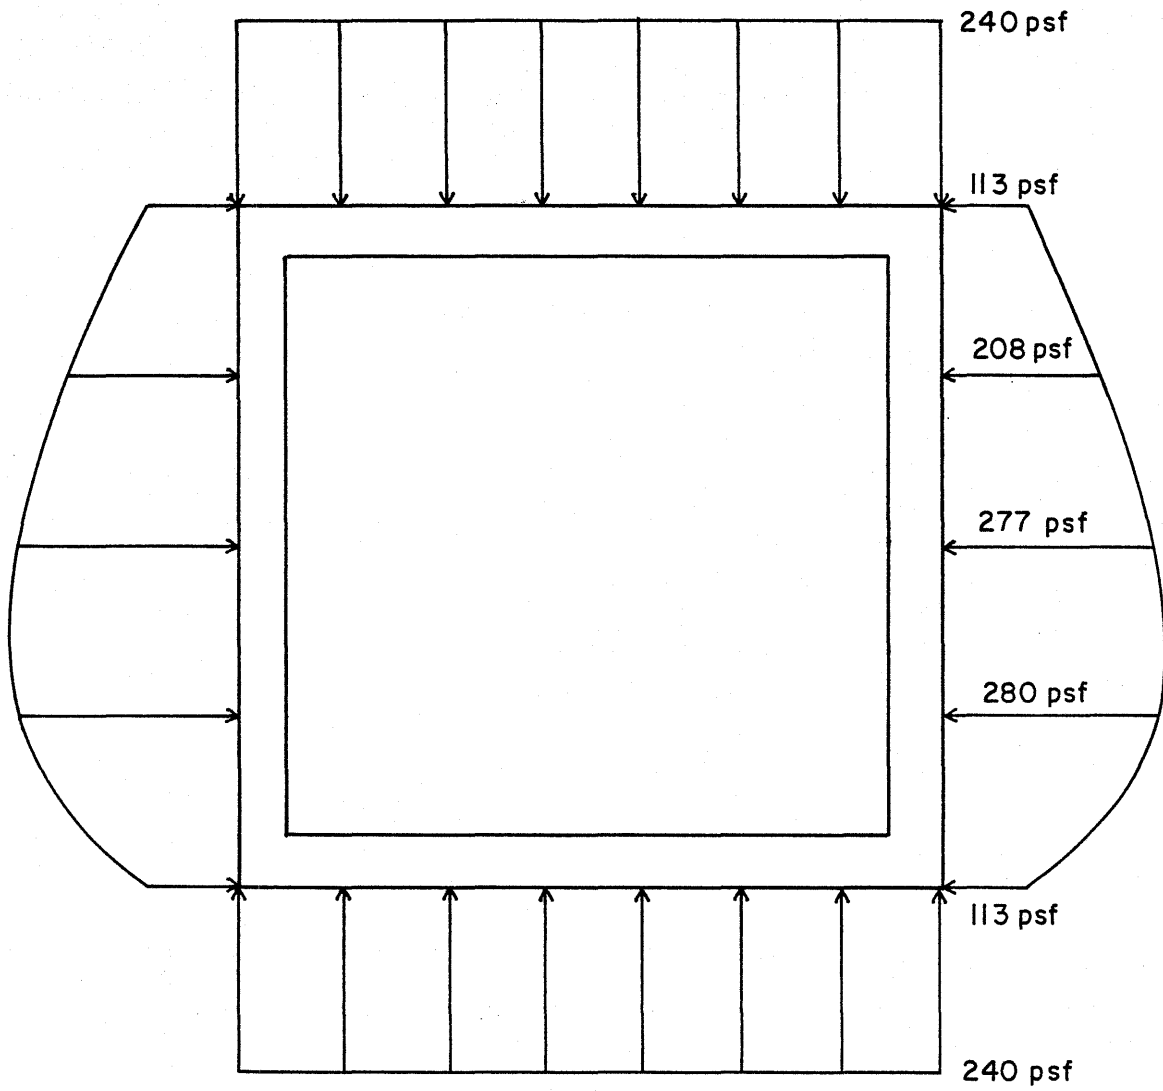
Vertical and Horizontal Dead Load Pressures for Example Illustrating Proposed Method with Arching
